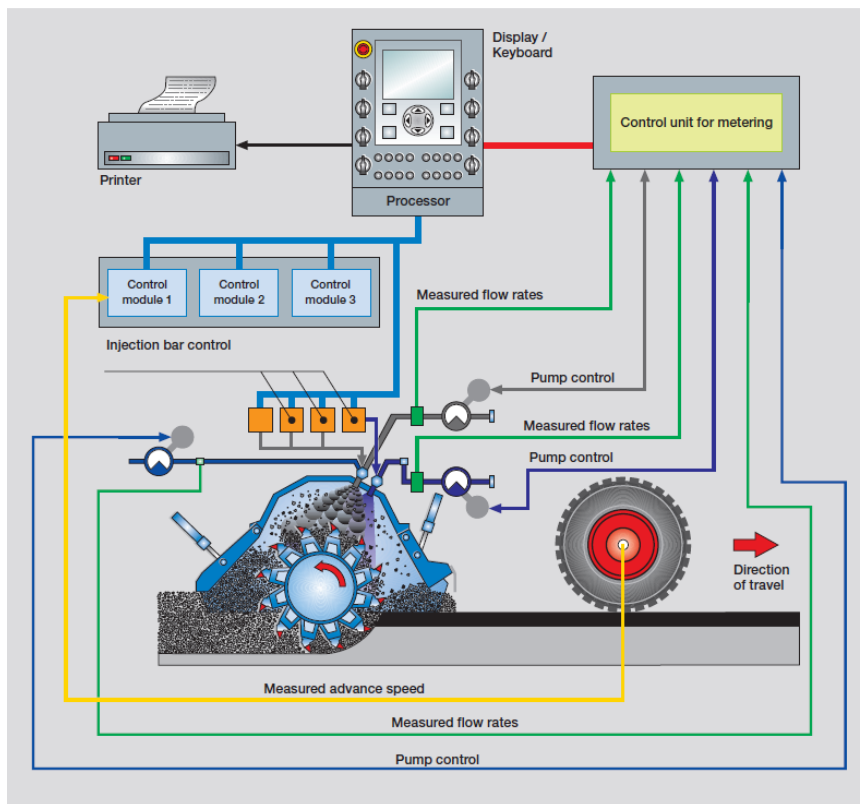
Control of in-situ pavement recycling with foamed bitumen (adapted from Wirtgen (2013))
